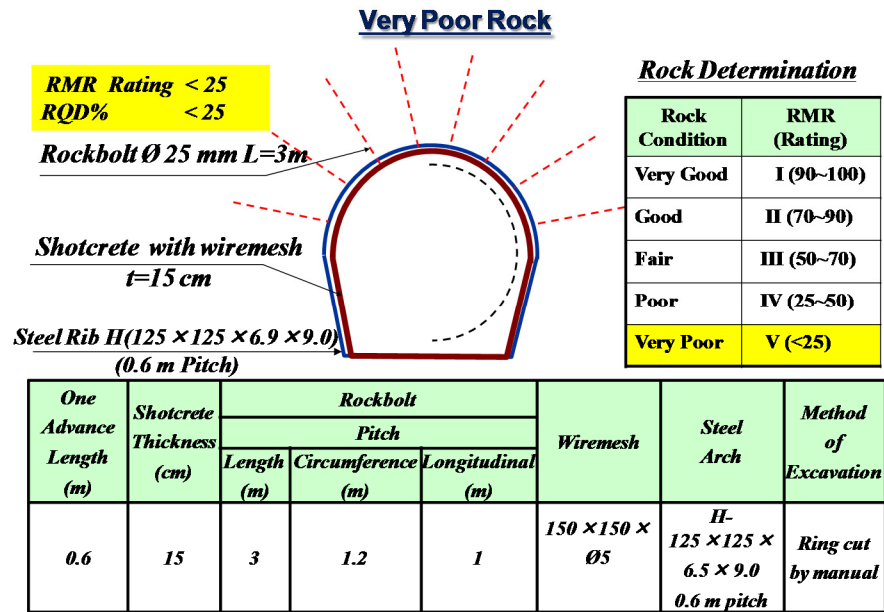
Determination of Rock Mass and Tunnel Supporting Systems
